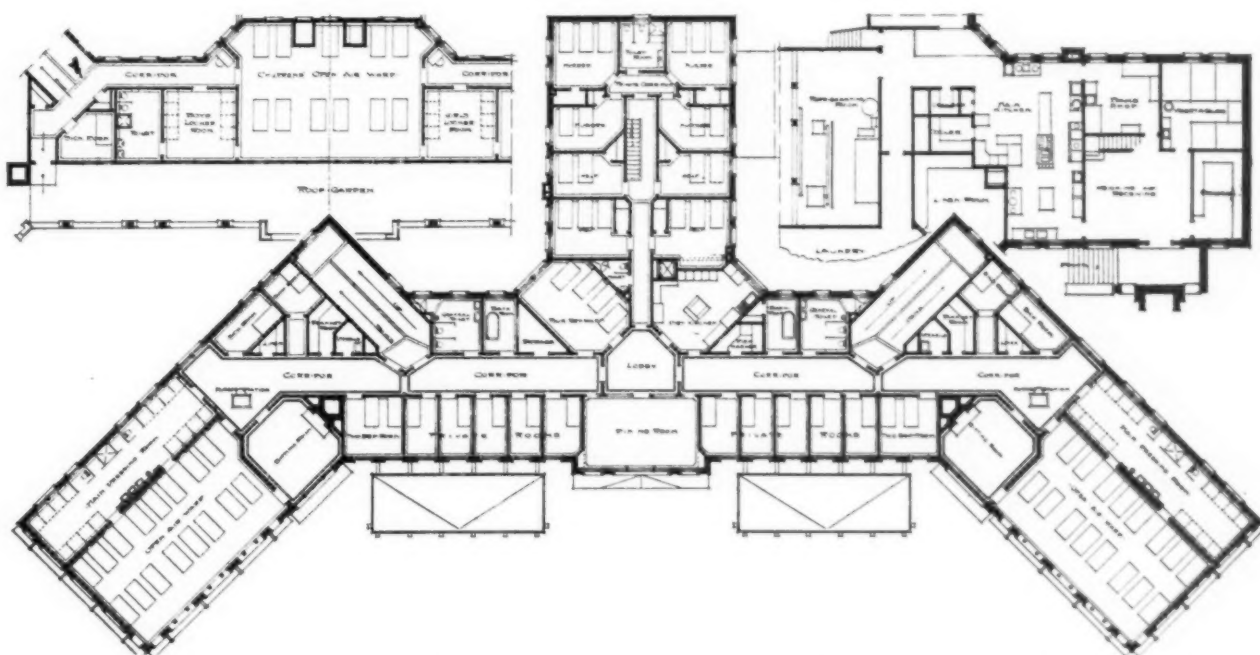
Second floor plan of the Jasper County Tuberculosis Hospital, with basement plan on the upper right and third floor plan on the upper left.
